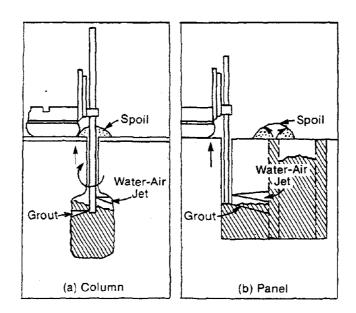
Jet grouting (a) columns and (b) panels (after Munfakh, et al., 1987)
